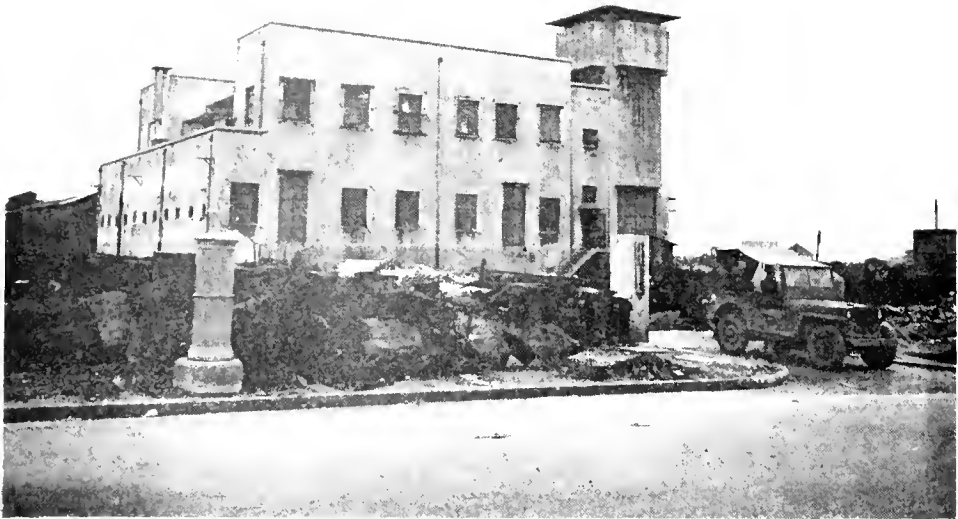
Oshima substation—General view of property showing building construction to protect against fires during earthquakes
